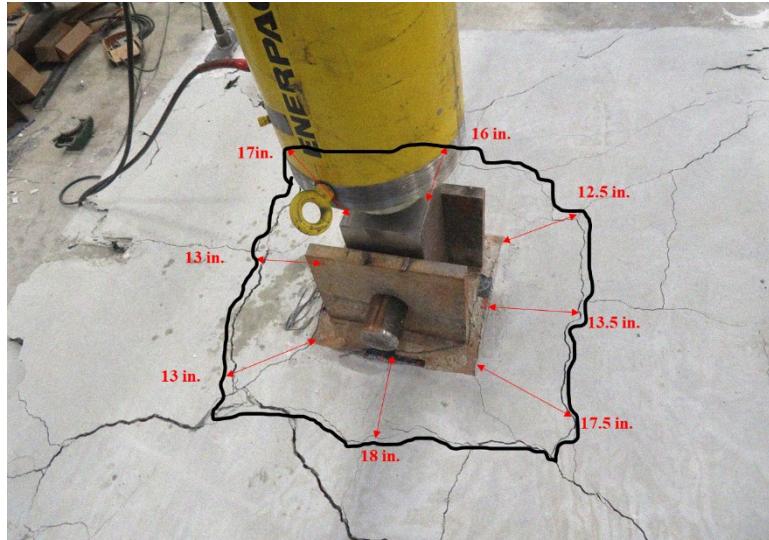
Plan view of cracks formed on the concrete surface
